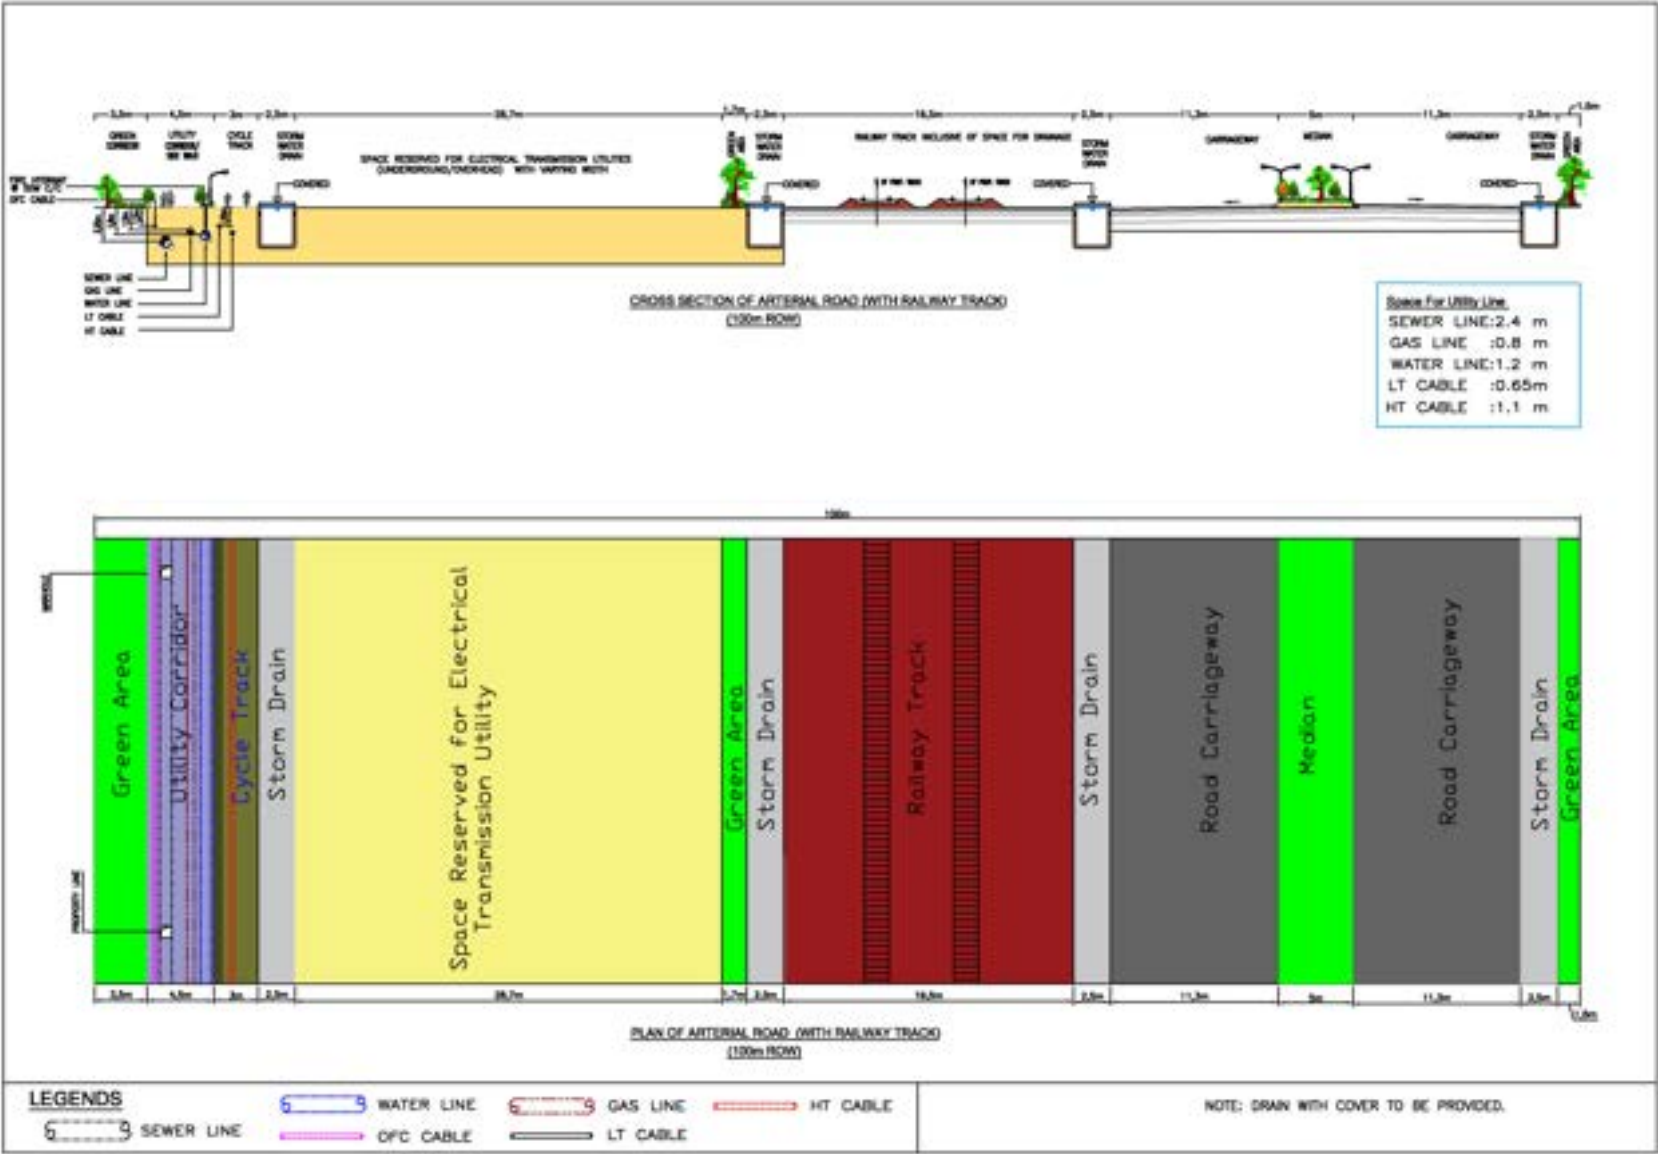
Cross Section and Plan of 100m ROW Arterial Road (with Rail Track)
